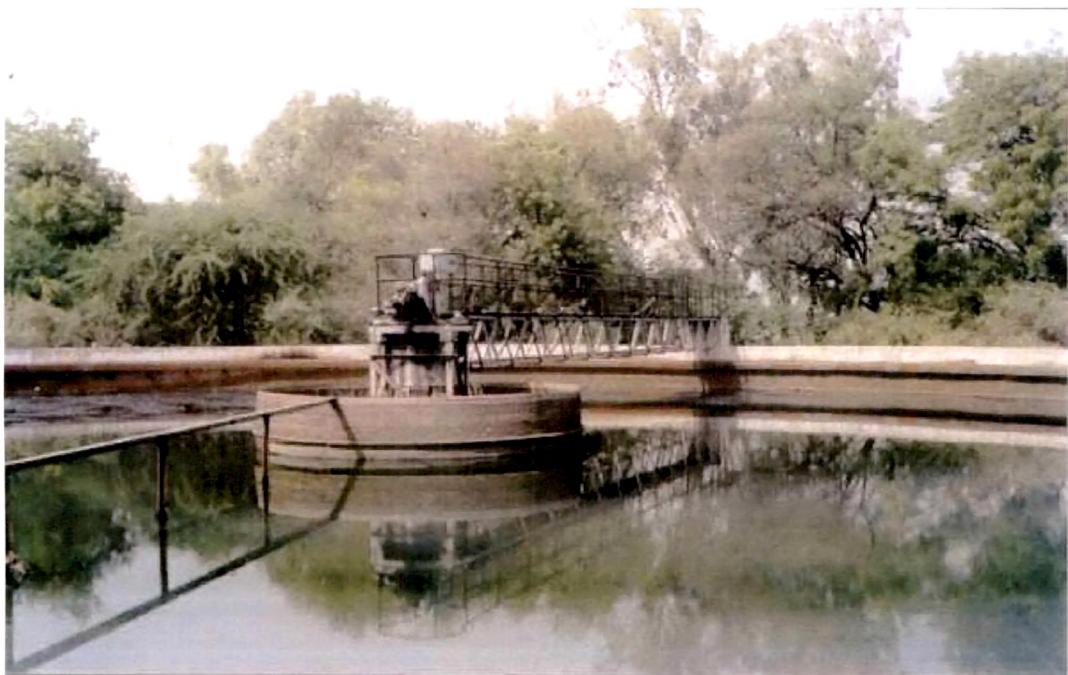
Secondary Settling Tank at Sewage Treatment Plant, Jaspur, Gandhinagar
